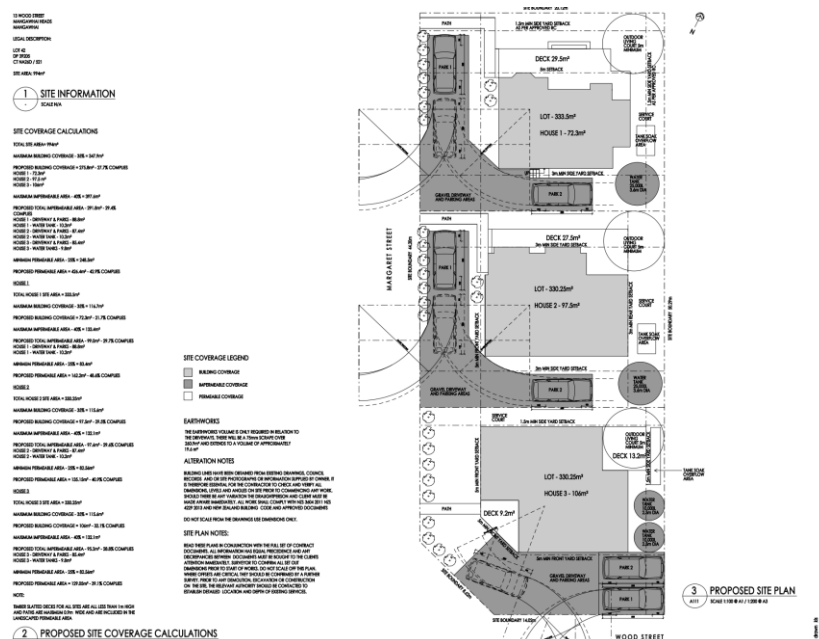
Application as lodged showing proposed Lots 1 – 3 including building footprints and site layout.
